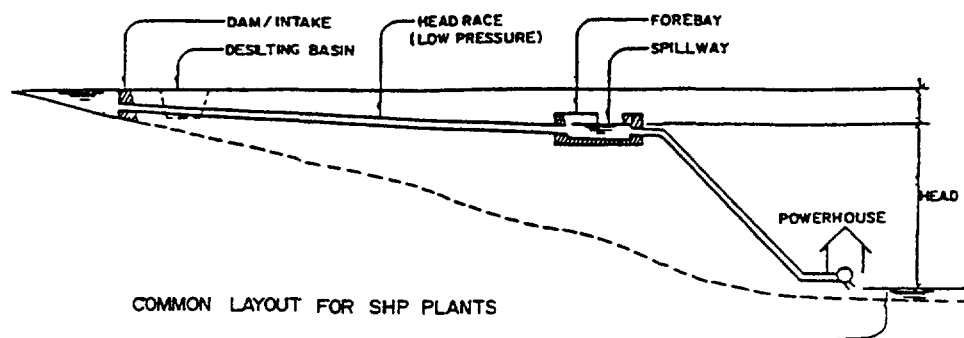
Alternative Layouts for Small Hydropower Plants.
